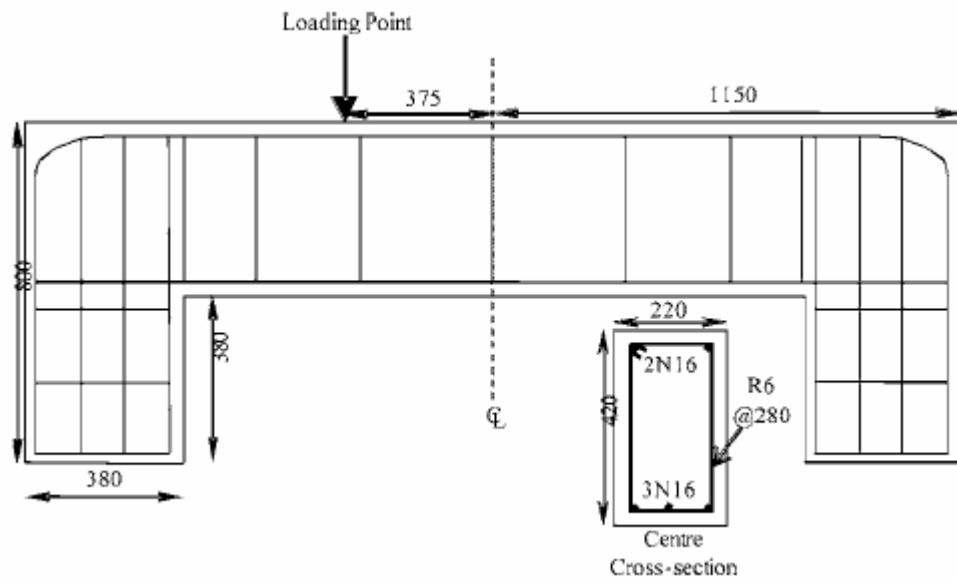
Deep beam specimen 2 details taken from Aravinthan and Suntharavadivel
